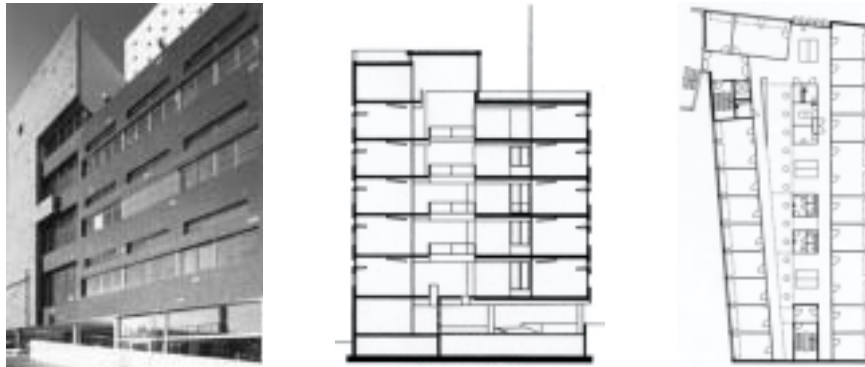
The Tax Office Building has an innovative appearing façade owing to the additional set of windows which ensure extra daylight and ventilation openings for the building's natural ventilation concept (*left*). Drawing of the section (*middle*) and drawing of the plan (*right*).
